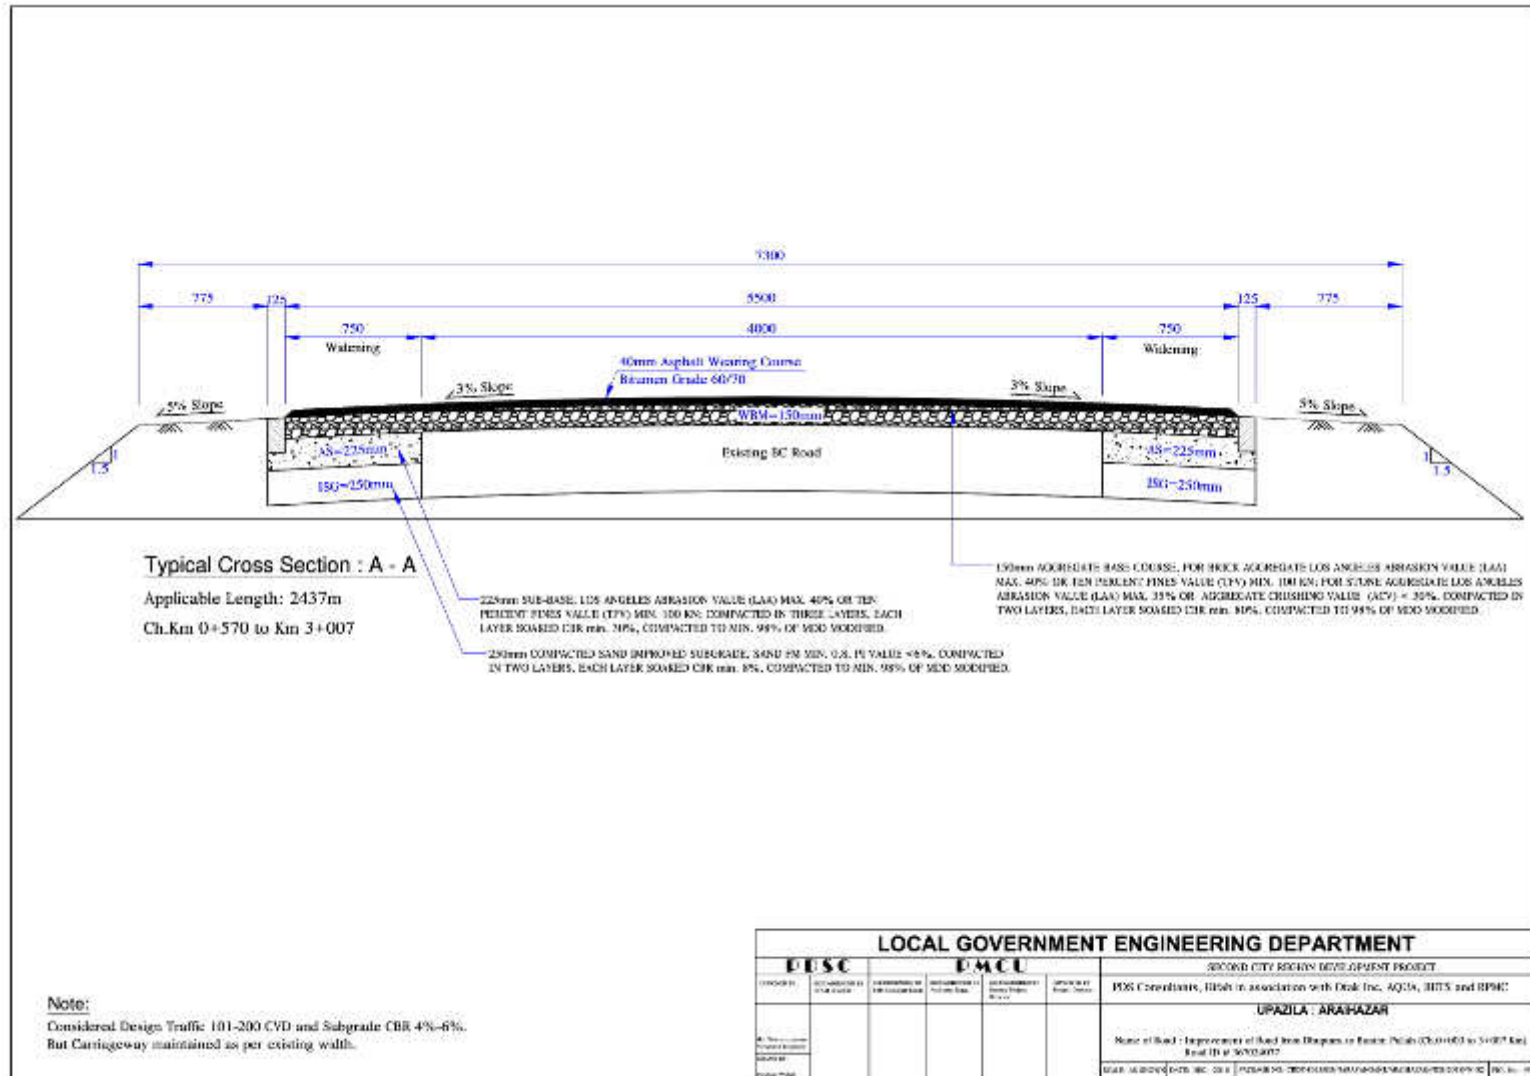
Typical Cross section of the Road (Ch. 0+570 - 3+007 km)
